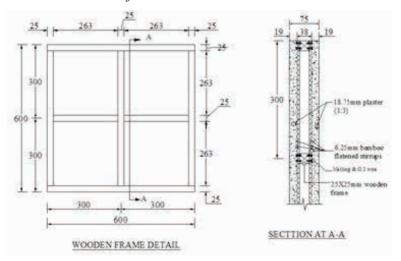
Sample type 2 with 600mm x 600mm panel size and thickness of 75 mm. The cross-section of wooden frame is 25mm x 25mm. Bamboo strips of 6.25mm and 18.75mm, plaster with cement/sand ratio of 1:3 is used. The joint connections are made with nails.
